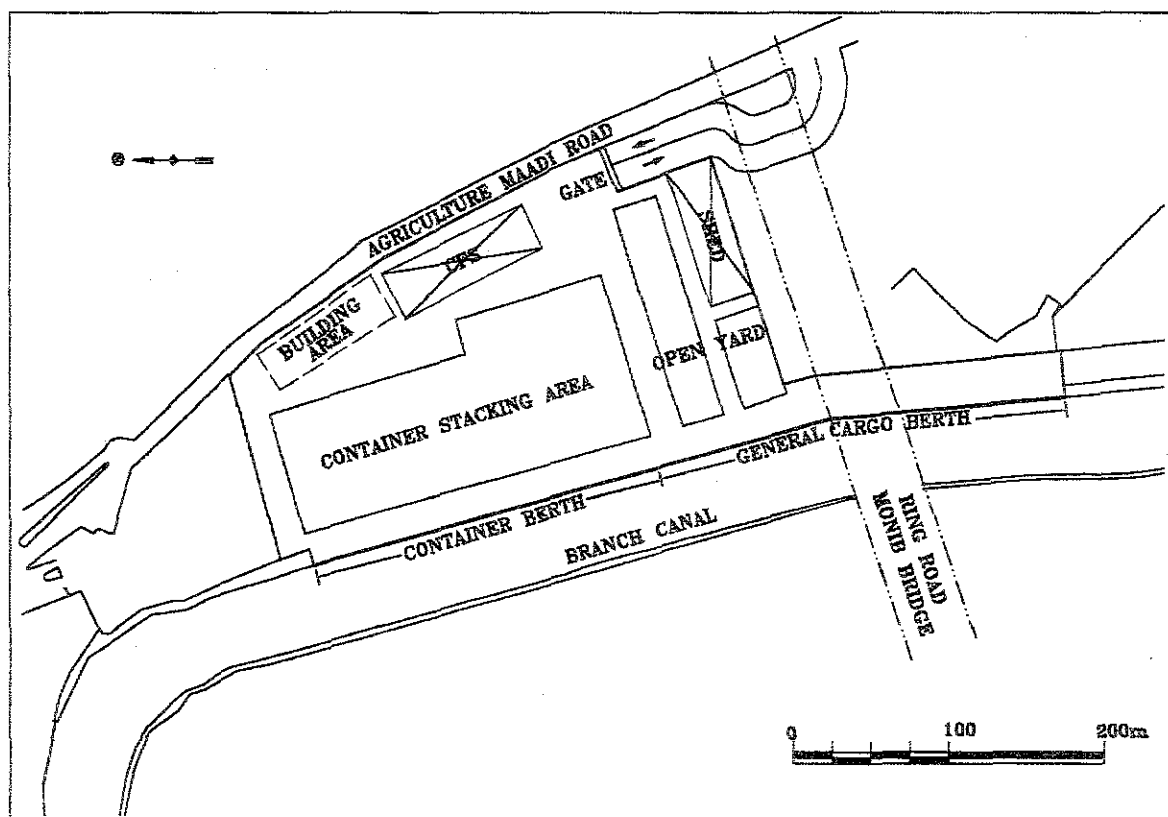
Layout Plan of Ather El Nabi Port (in 2010)
